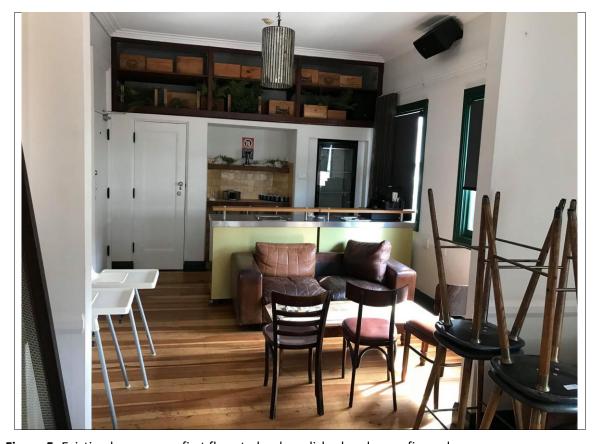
Existing bar area on first floor to be demolished and reconfigured
